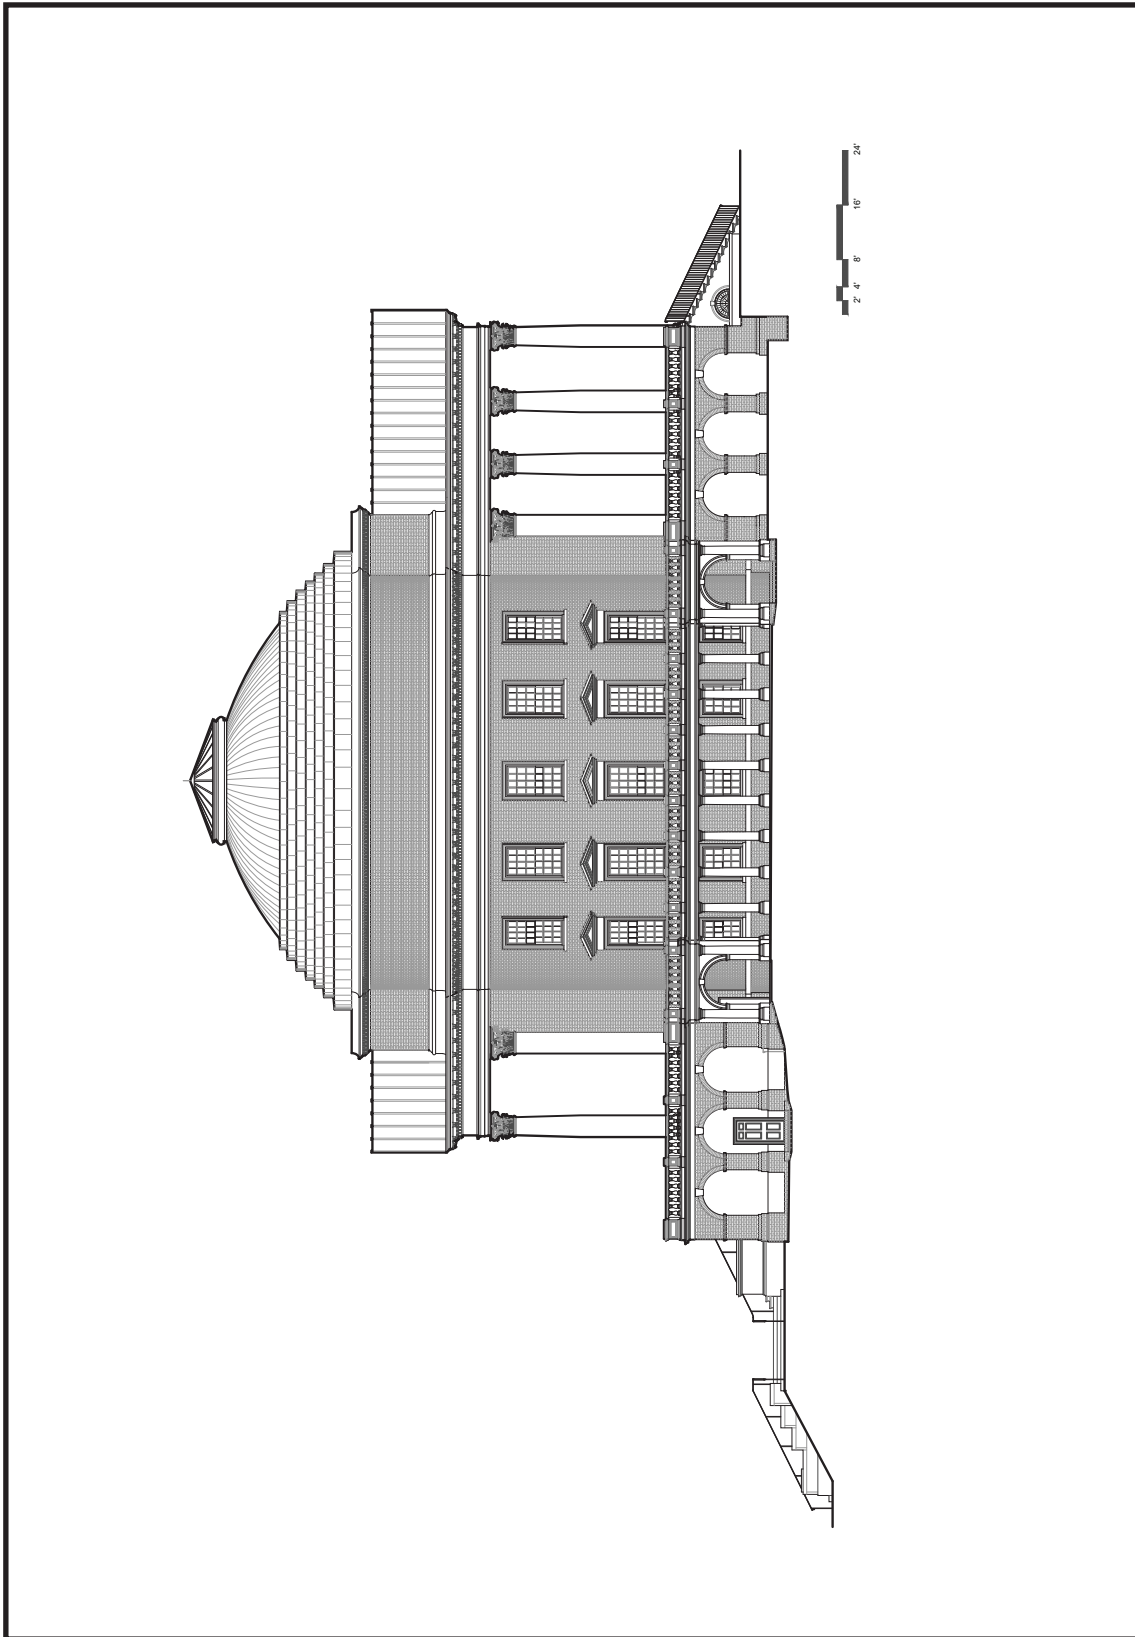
West elevation. Drawing by John G. Waite Associates, Architects, 2022.
